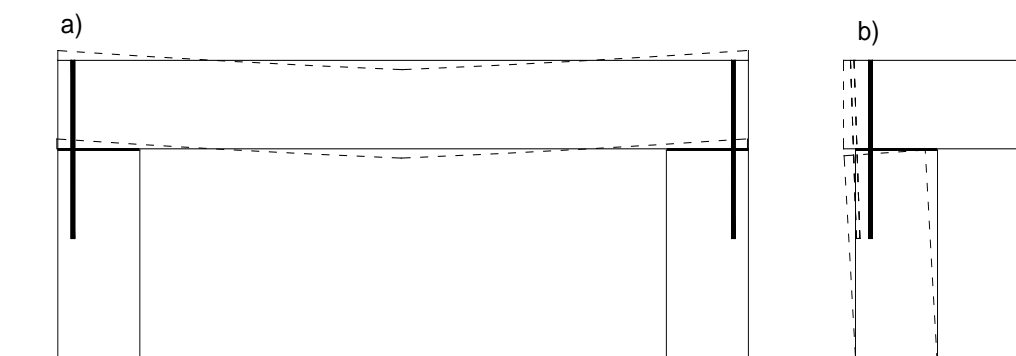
Example of beam-to-column dry connection with possible degree of fixity
